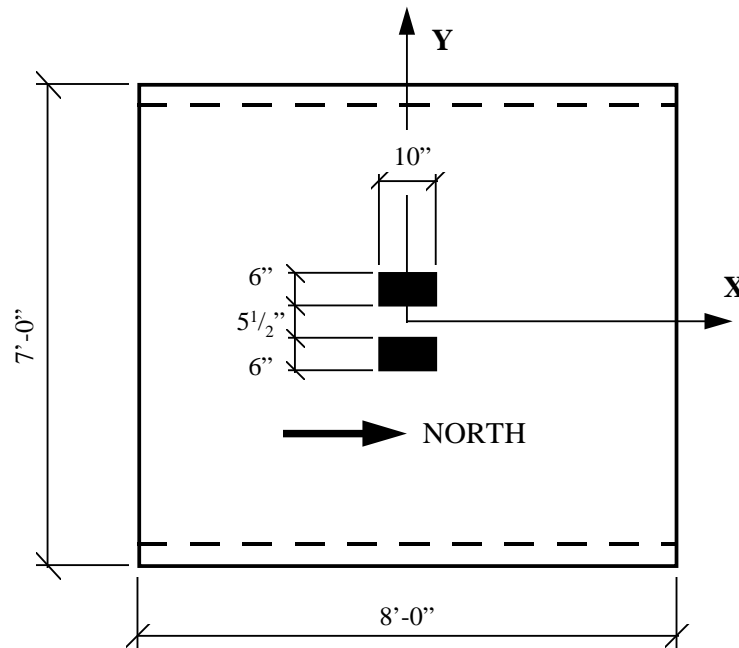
Loading footprint used for cast-in-place pulsating fatigue test specimens.
